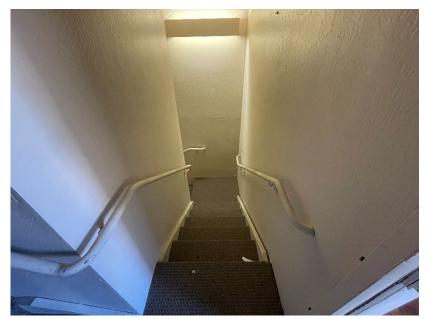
Typical non-historic stair well, floors one through roof. (Photo taken by P&T 03/14/2025)
